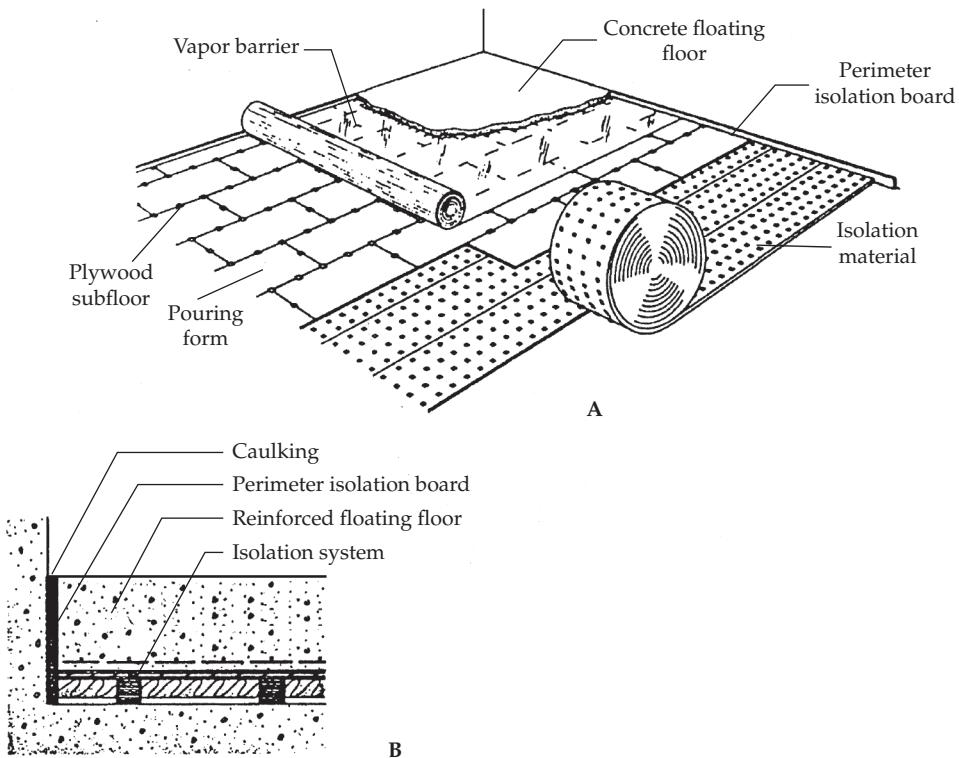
Example of a concrete floating floor construction. (A) Overall floor assembly. (B) Detail of floor perimeter. (*Kinetics Noise Control*.)
